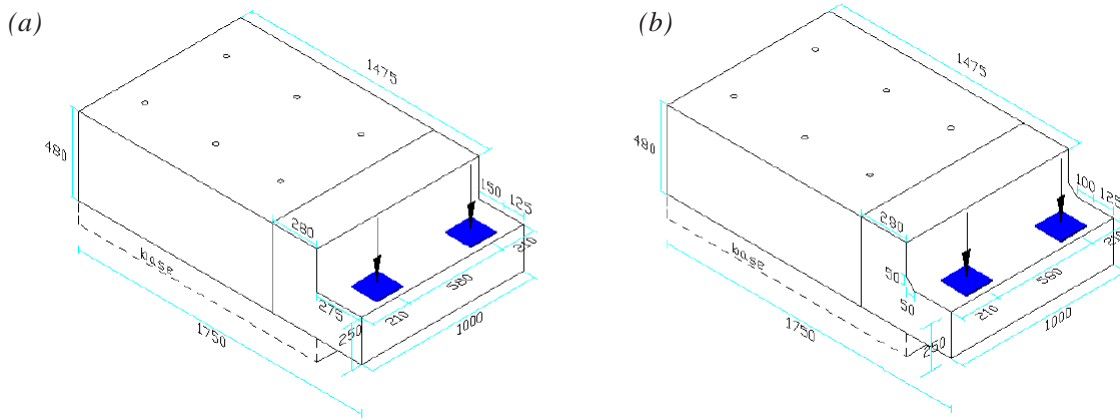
Geometry of the specimens (units in millimeters): (a) specimens E1 and E2; and (b) specimen E3
